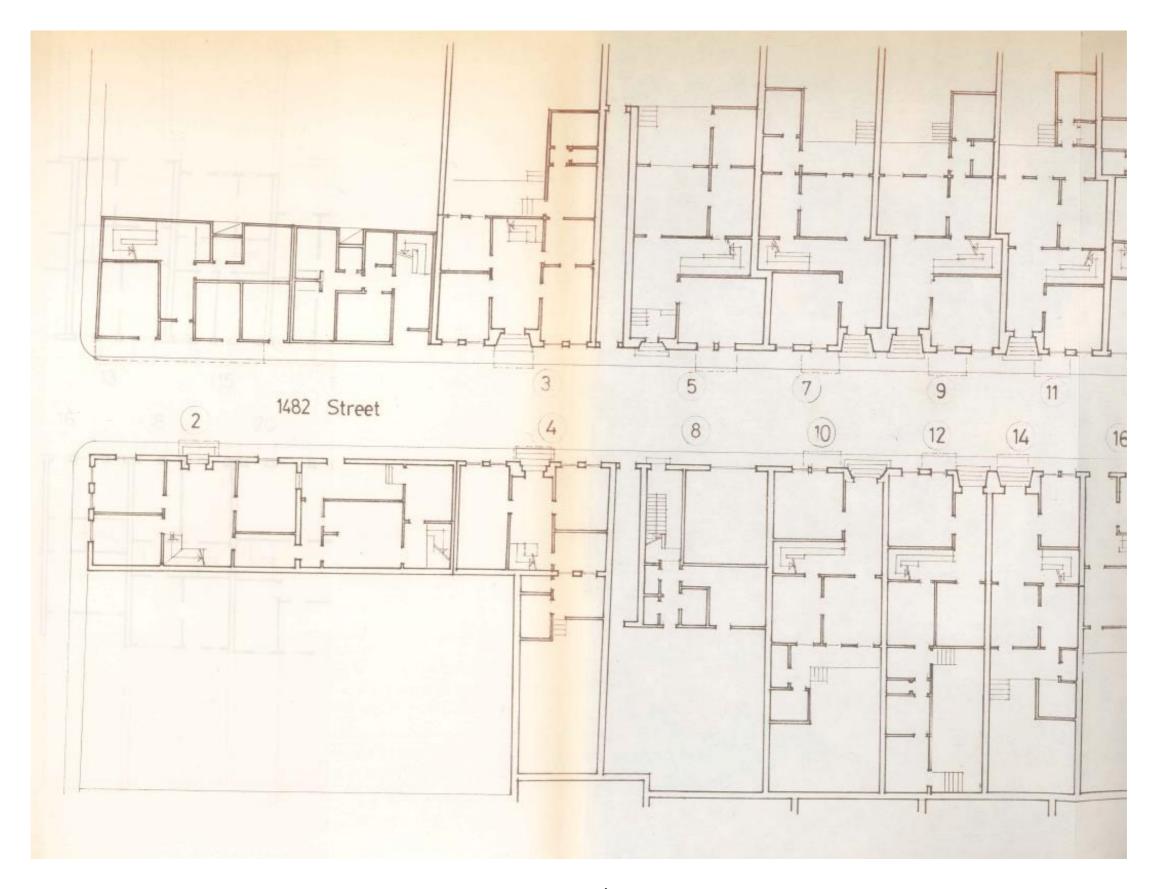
Ground Floor Plans of İzmir Houses on 1482 street (Source:Moral 1990)
